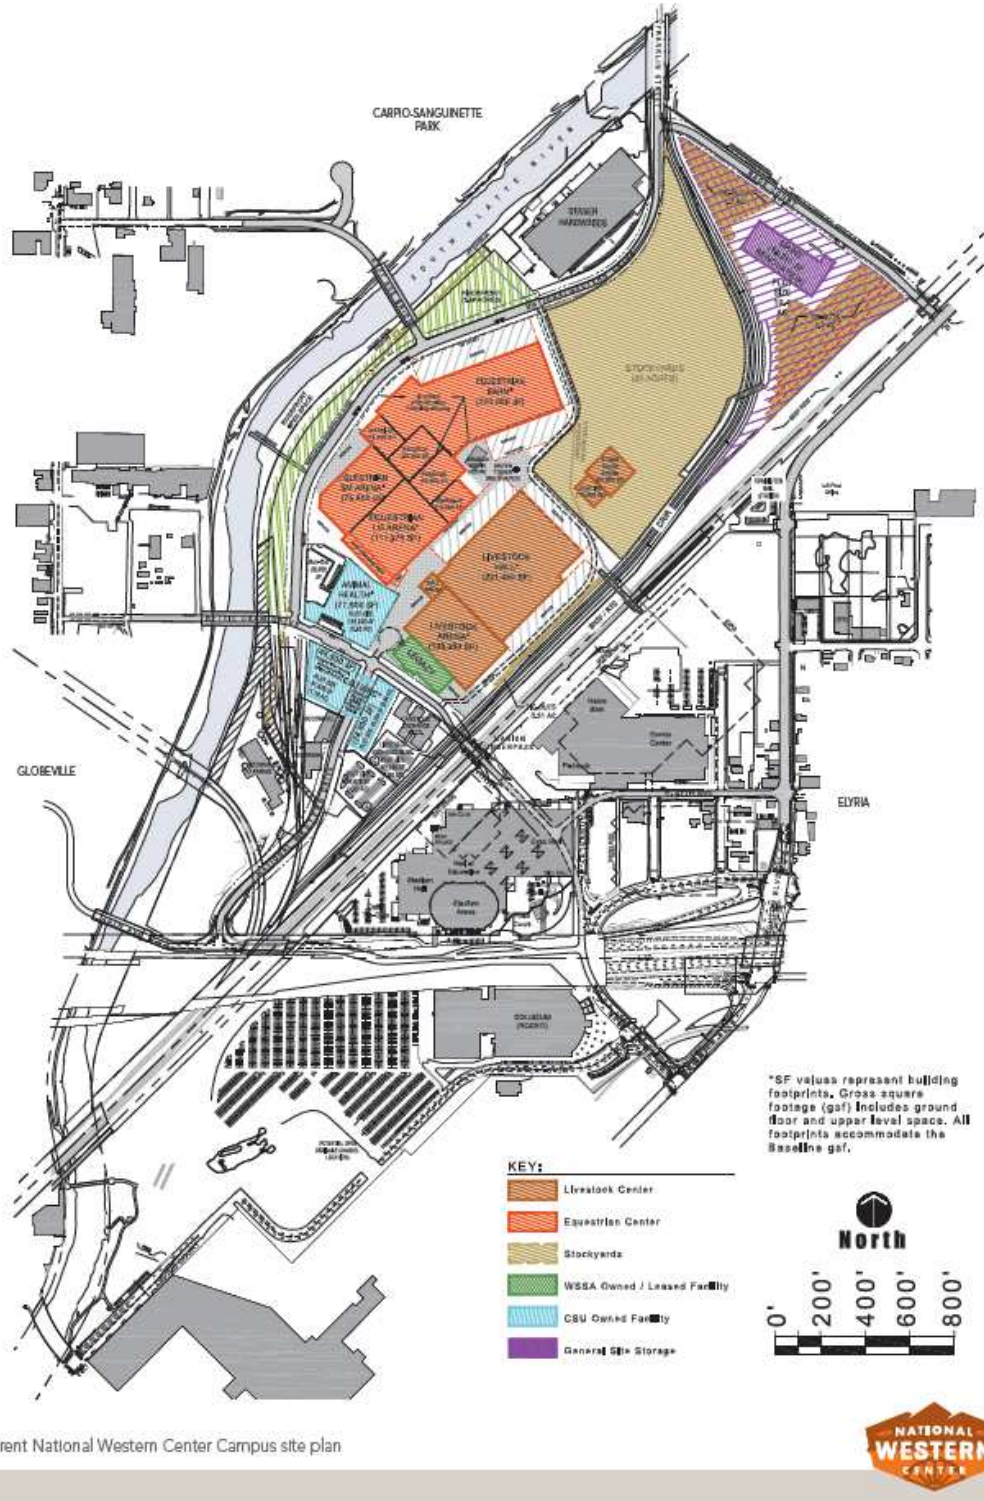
NWC Site Plan showing the geographical layout of the major building complexes. The orientation of each building coupled with architectural renderings of flat or sloped roofs was used to calculate the PV generation potential of each separate building complex. [59]
